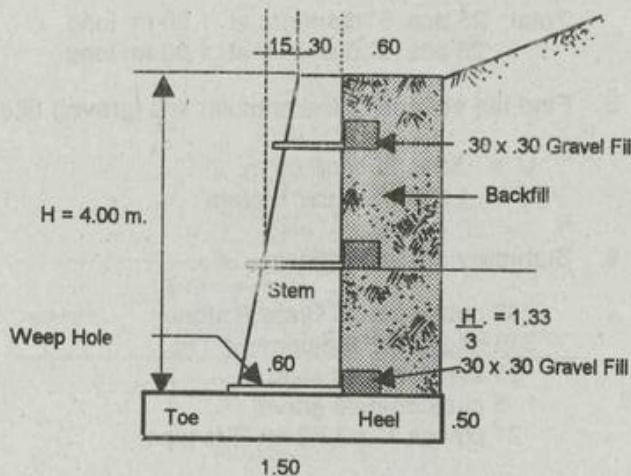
CROSS SECTION OF RETAINING WALL
